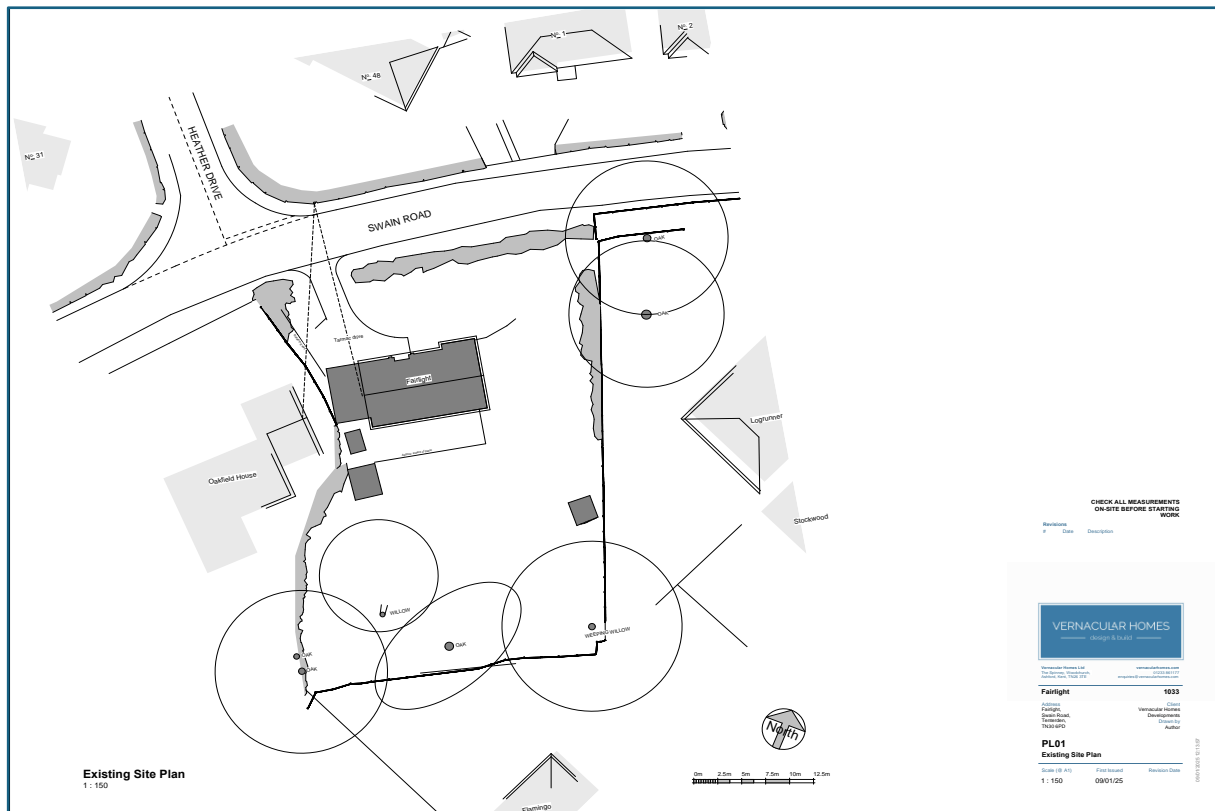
LOCATION OF LAND & BUILDING AT FAIRLIGHT
